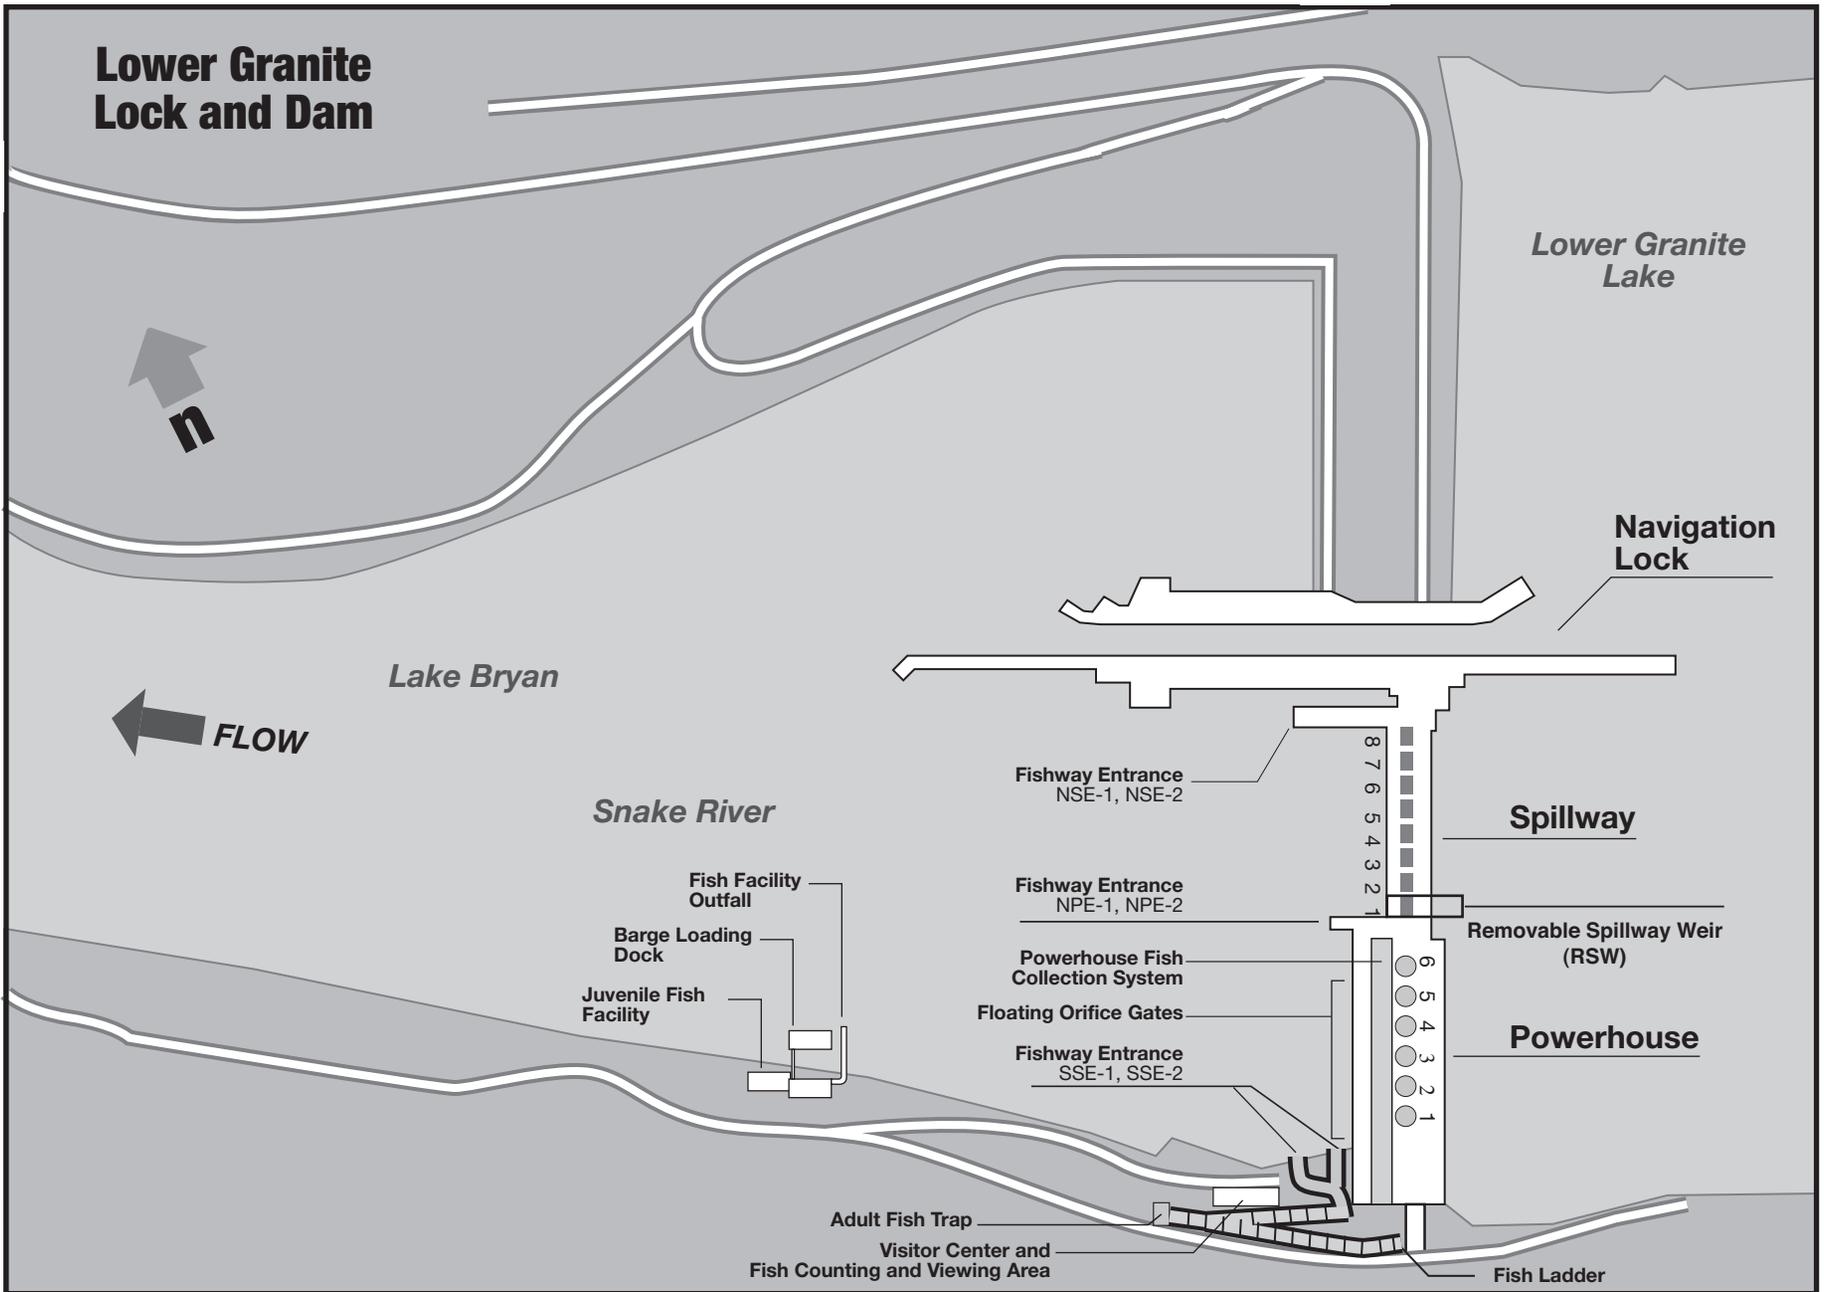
Lower Granite Lock and Dam General Site Plan.
